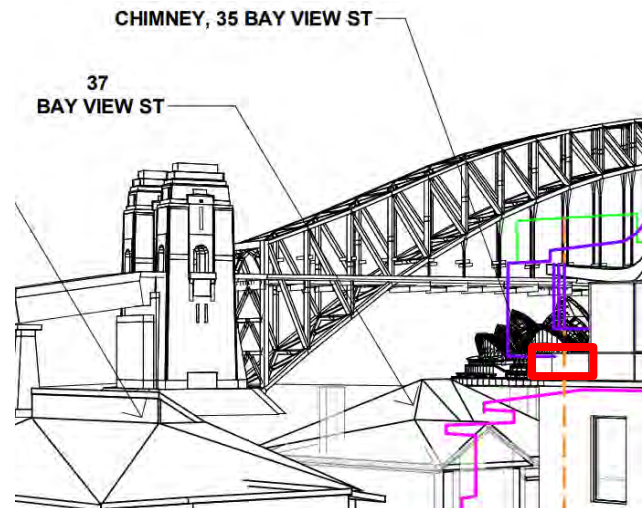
Proposed view from Unit 14/ 21 Waiwera Street
